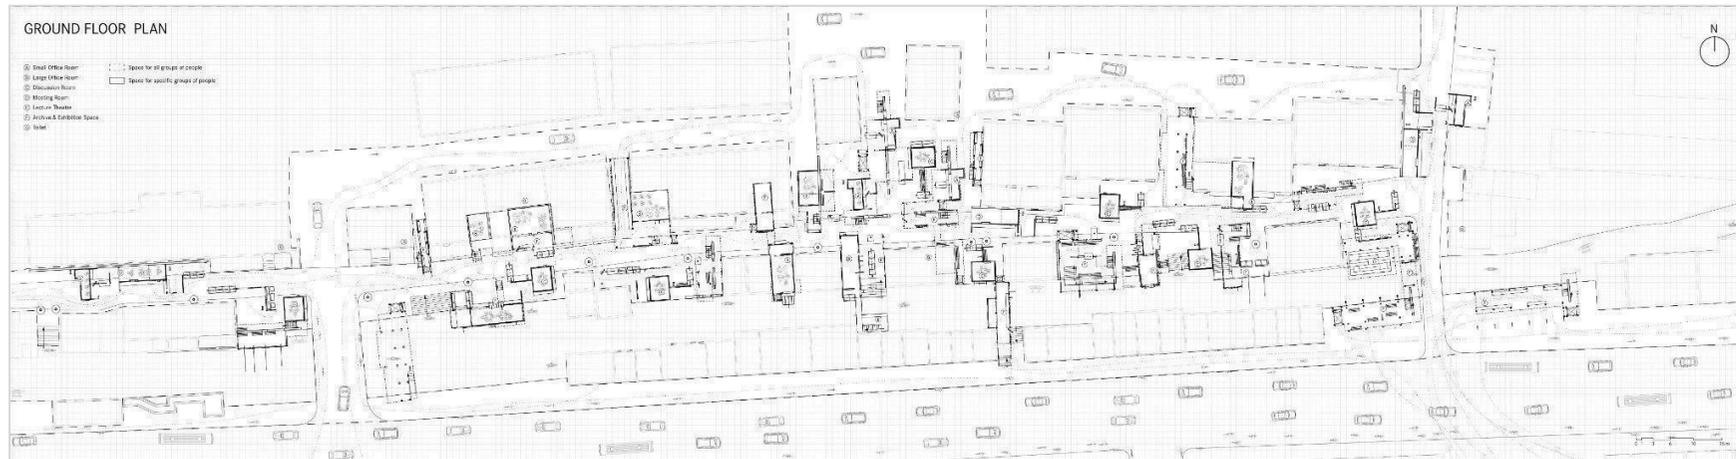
FYP Ground Floor Plan. Shucen Liu (2023).
